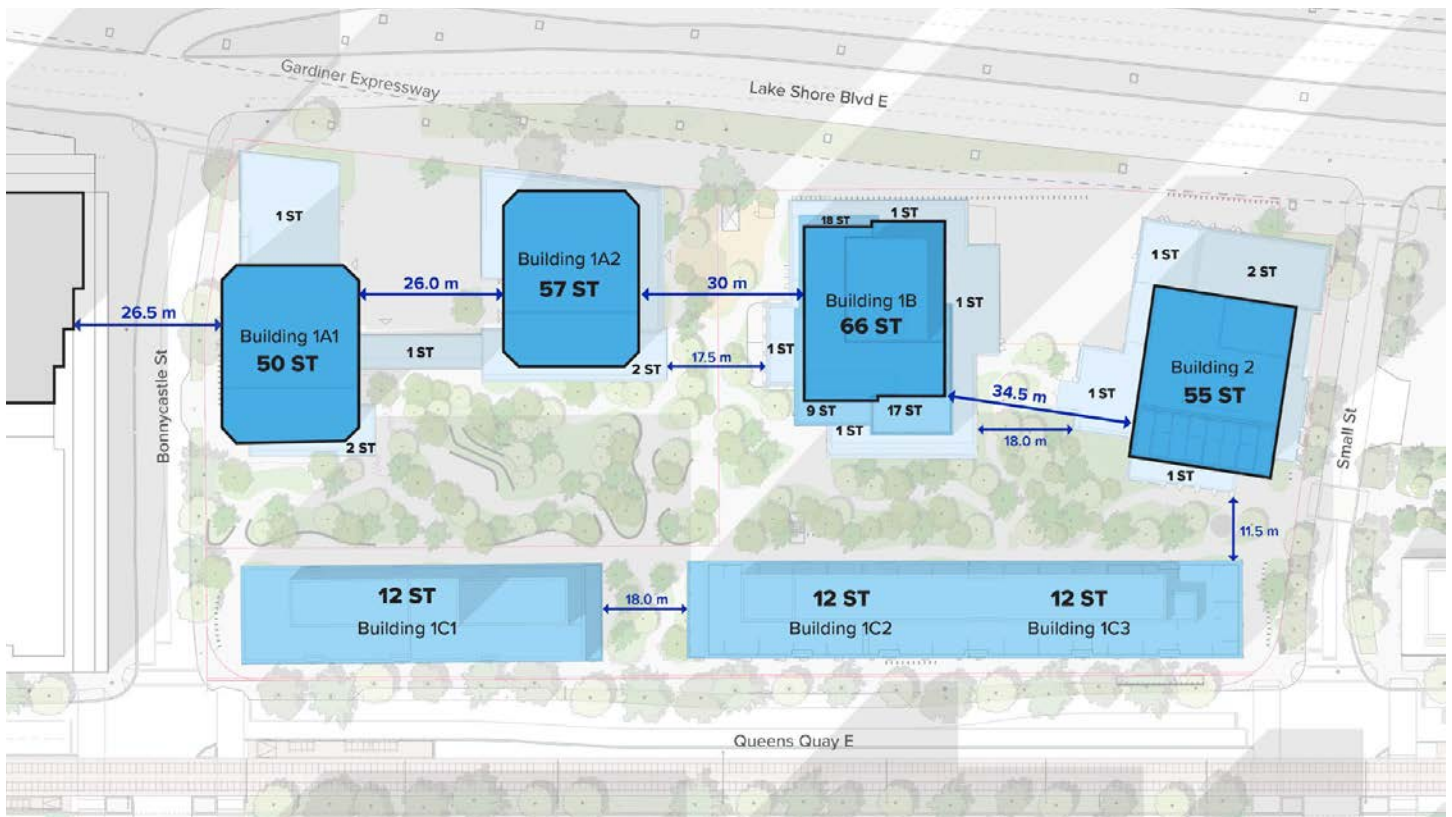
The building massing creates a high density urban neighbourhood with generous building separations that contribute to a comfortable public realm. Mid-rise buildings face Queens Quay Boulevard while towers are located to the north and step back from a low-scale podium that frames the north edge of the Community Forest.
